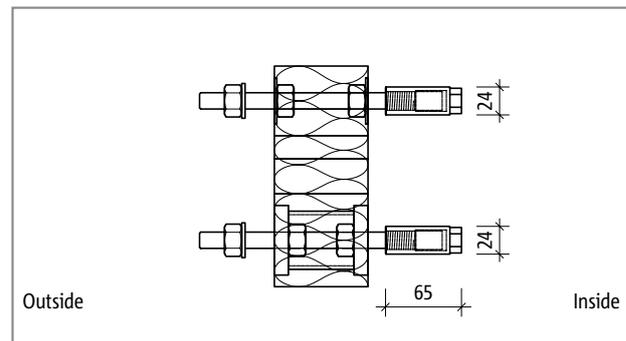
Schöck Isokorb® type S with cap nuts: Cross-section
